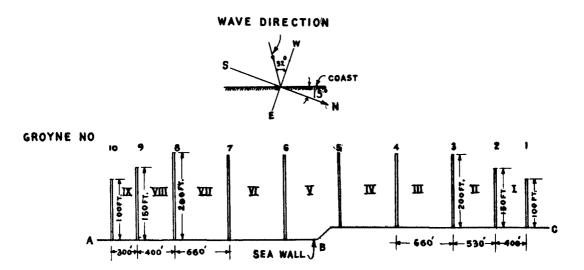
Plan of sea wall and groynes in a one mile experimental reach; portion A B is masonry wall over sand core and A C is rubble mound sea wall.
